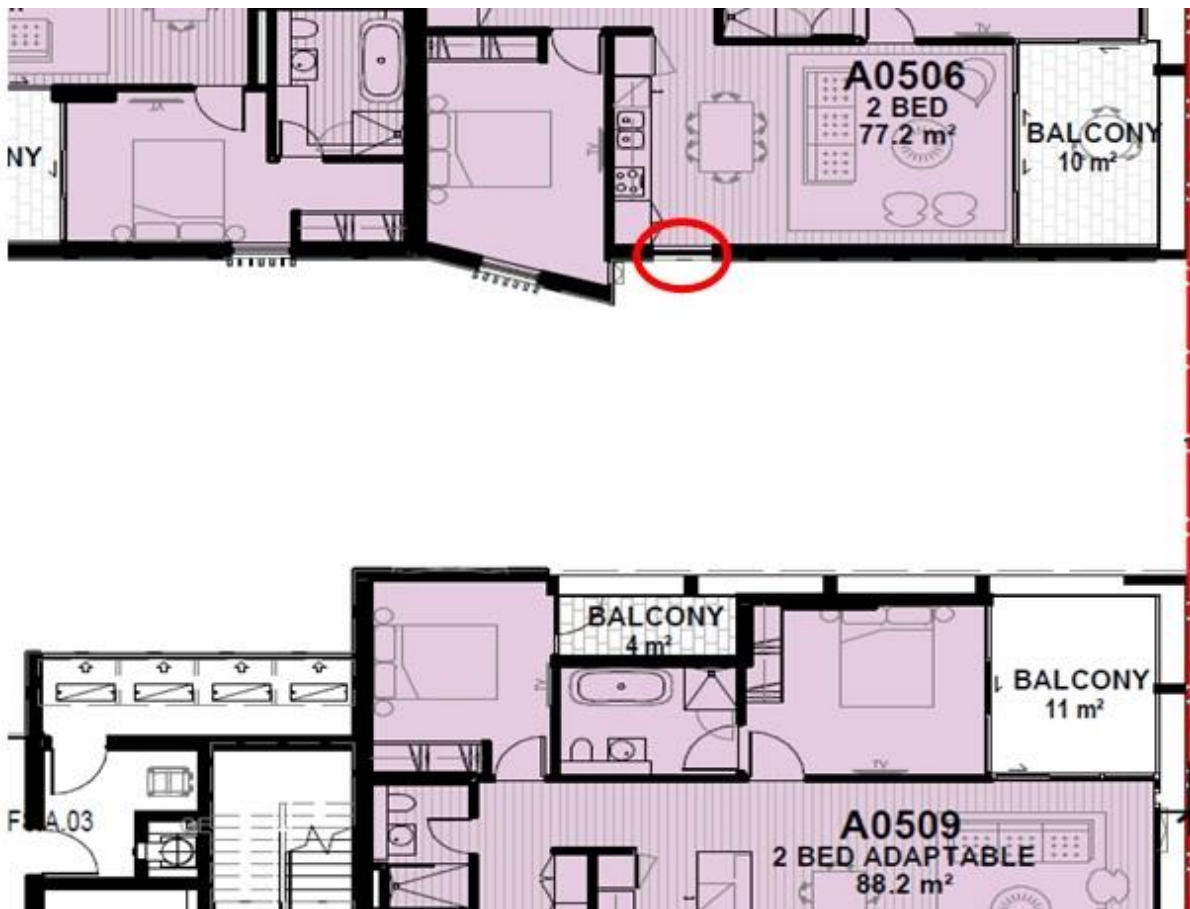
Level 5 floor plan, showing non-treated windows outlined in red.
